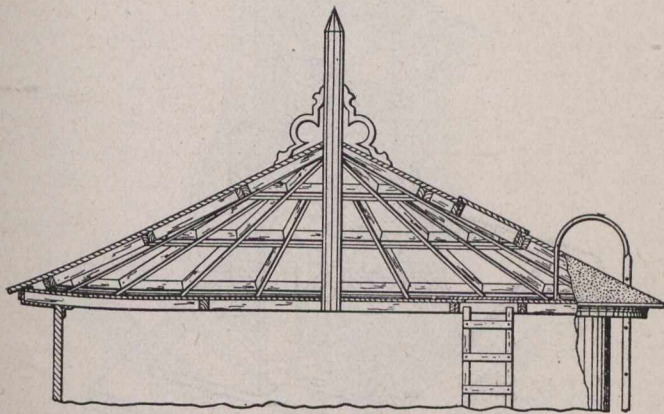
A Good Design of Double Roof for Elevated Tank.
